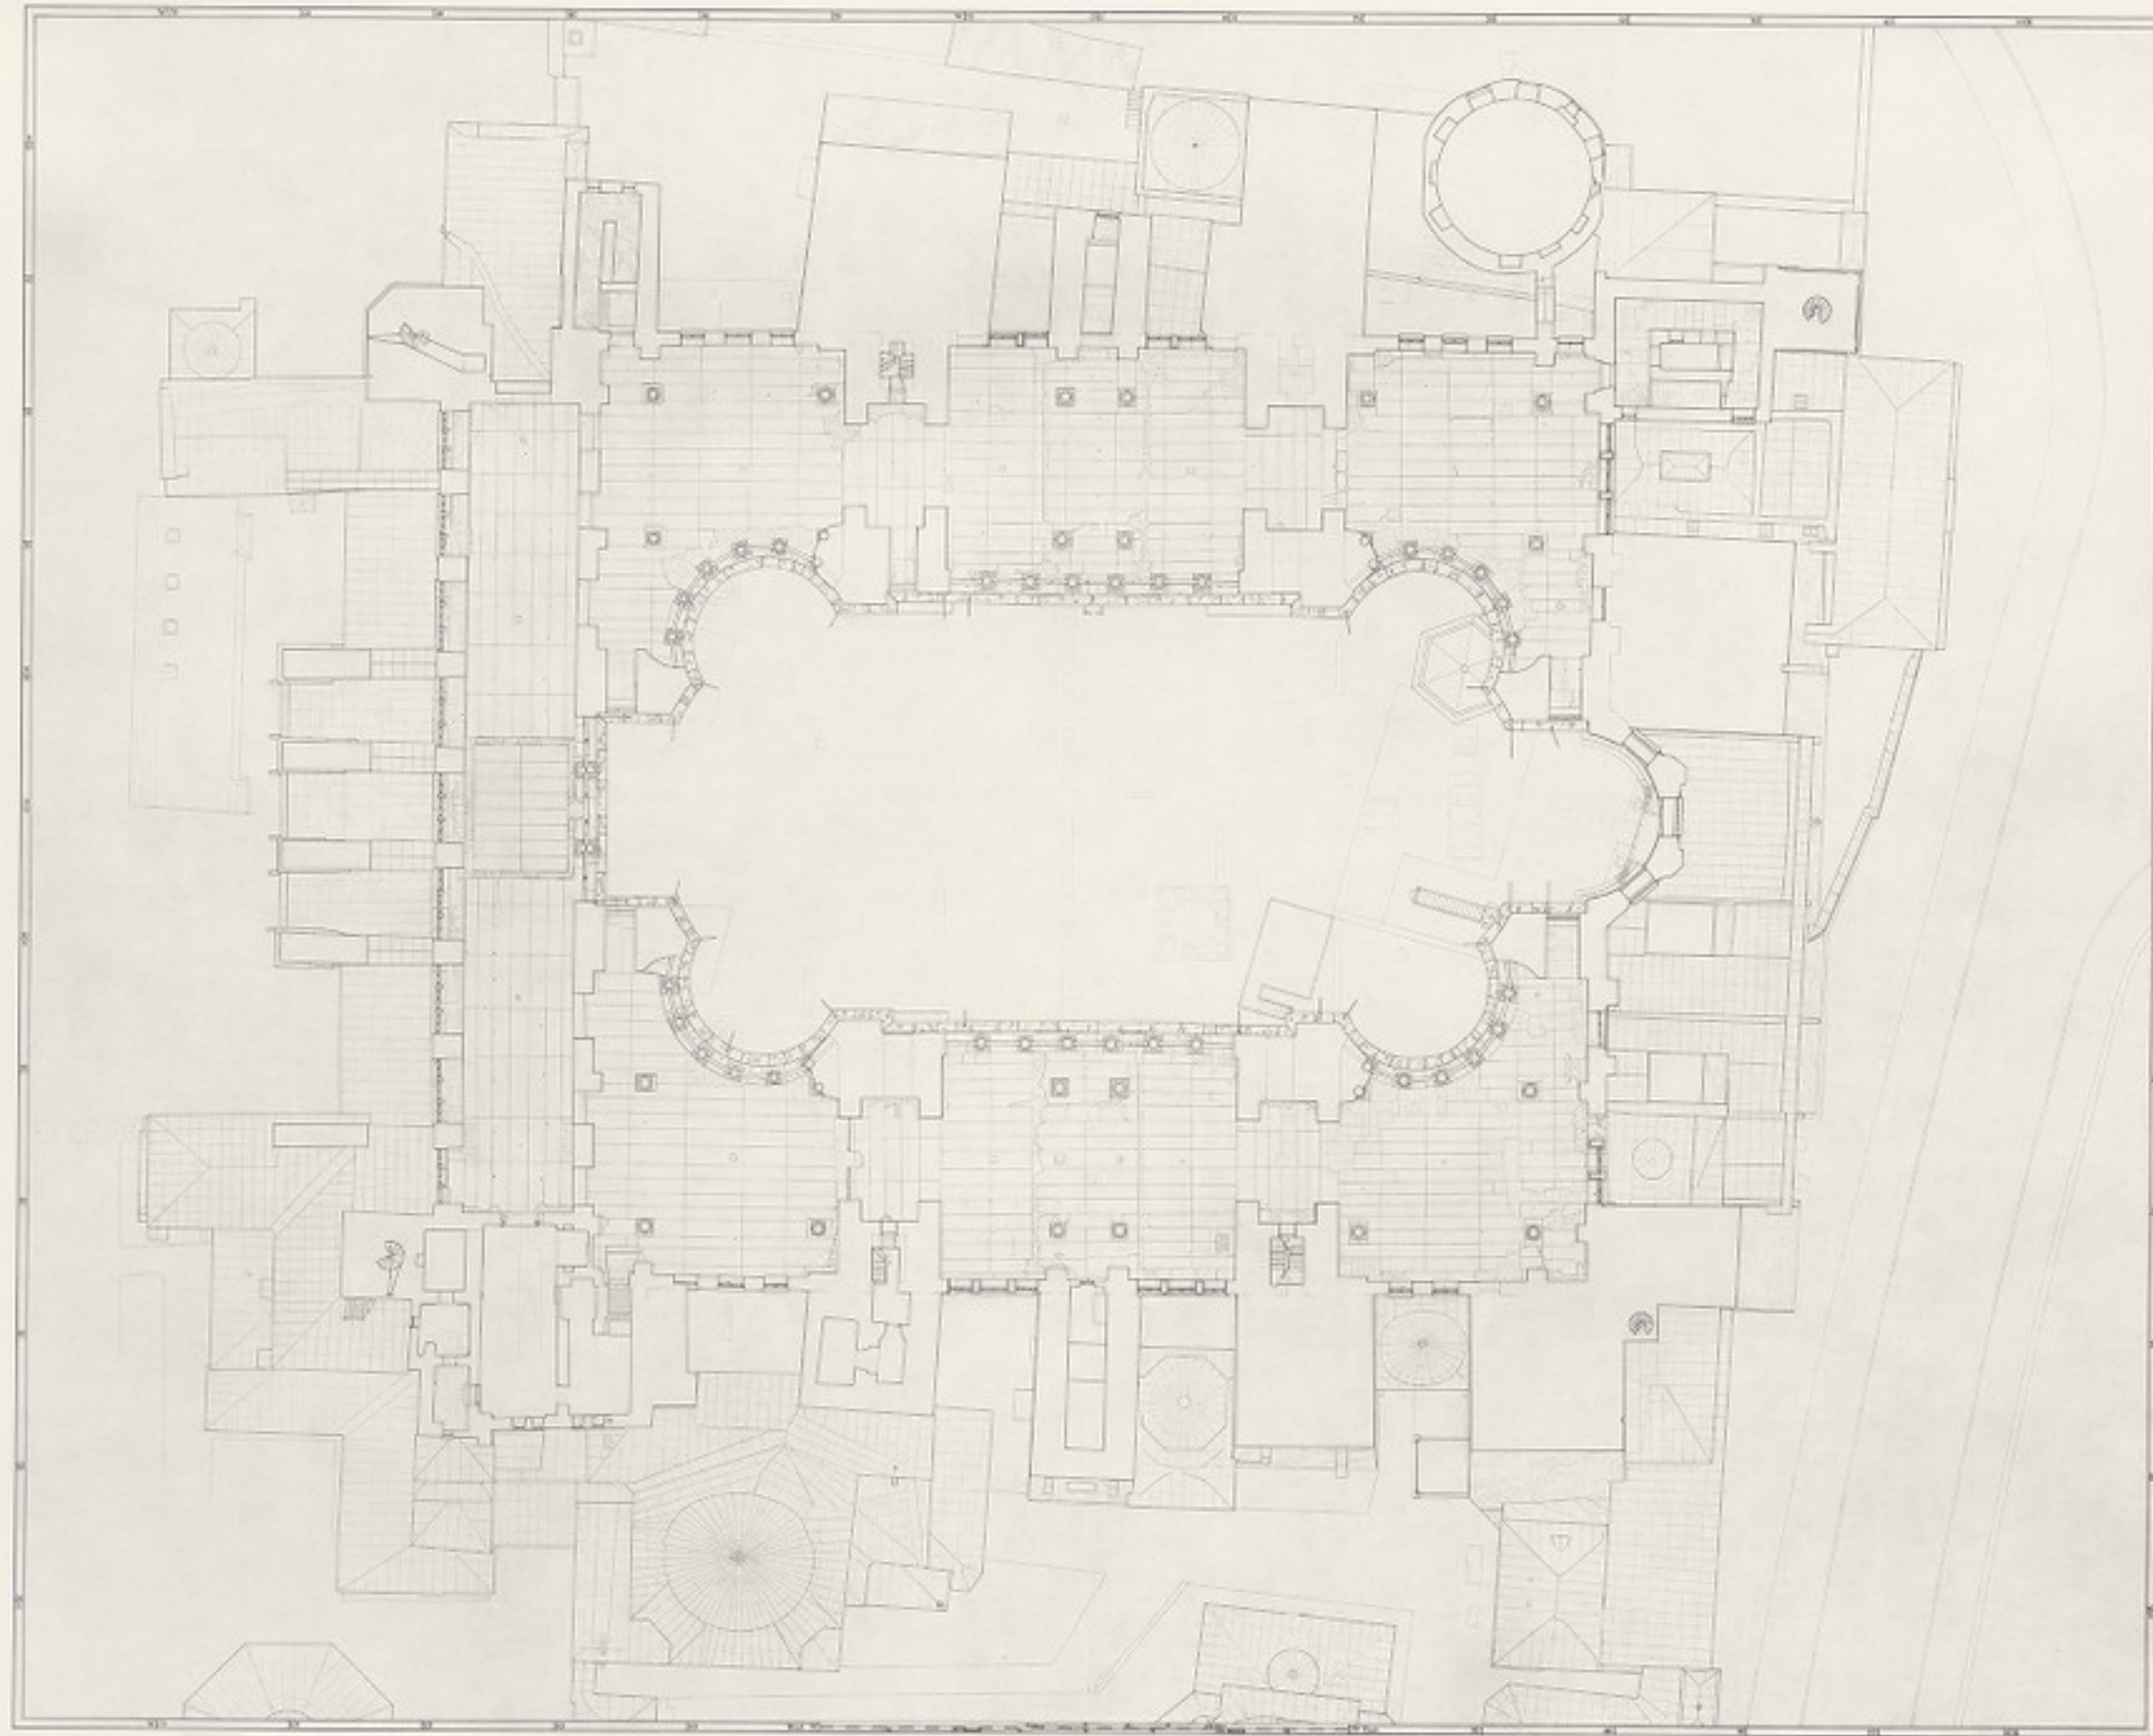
GENERAL PLAN AT GALLERY LEVEL
